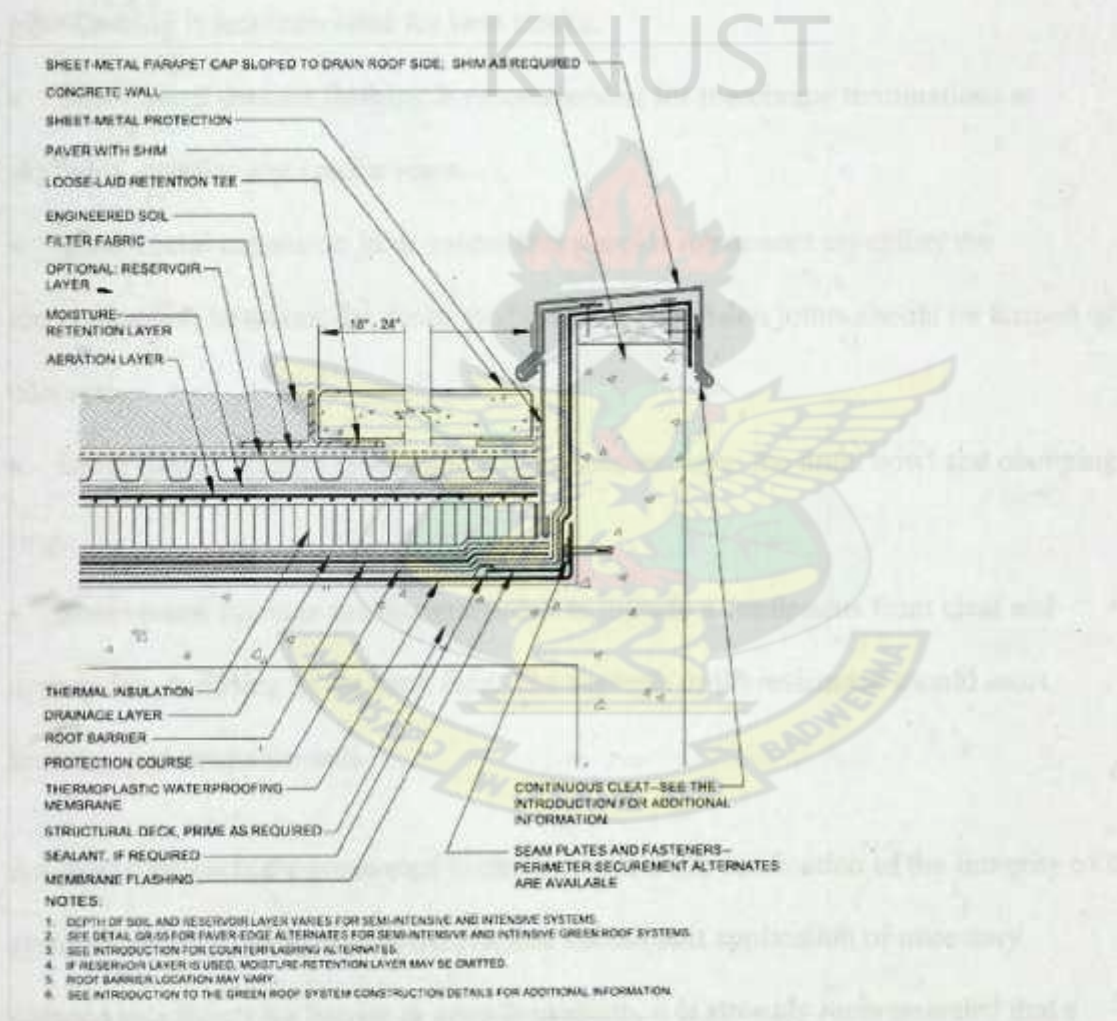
Low parapet flashing for thermoplastic waterproofing membrane—extensive (shallow) green roof system (source: The NRCA Green Roof Systems Manual—2007 Edition)
